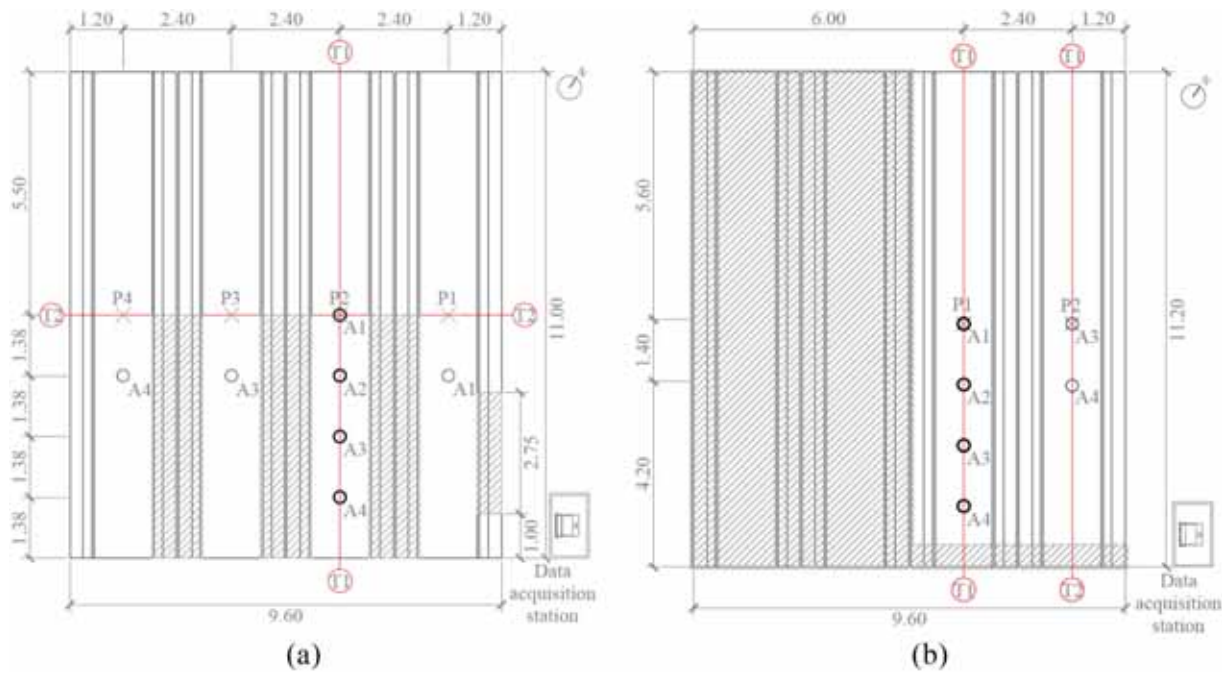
Position of instruments and load paths: (a) ground floor deck; (b) roof deck. Note that transverse and longitudinal accelerometers dispositions are alternative
